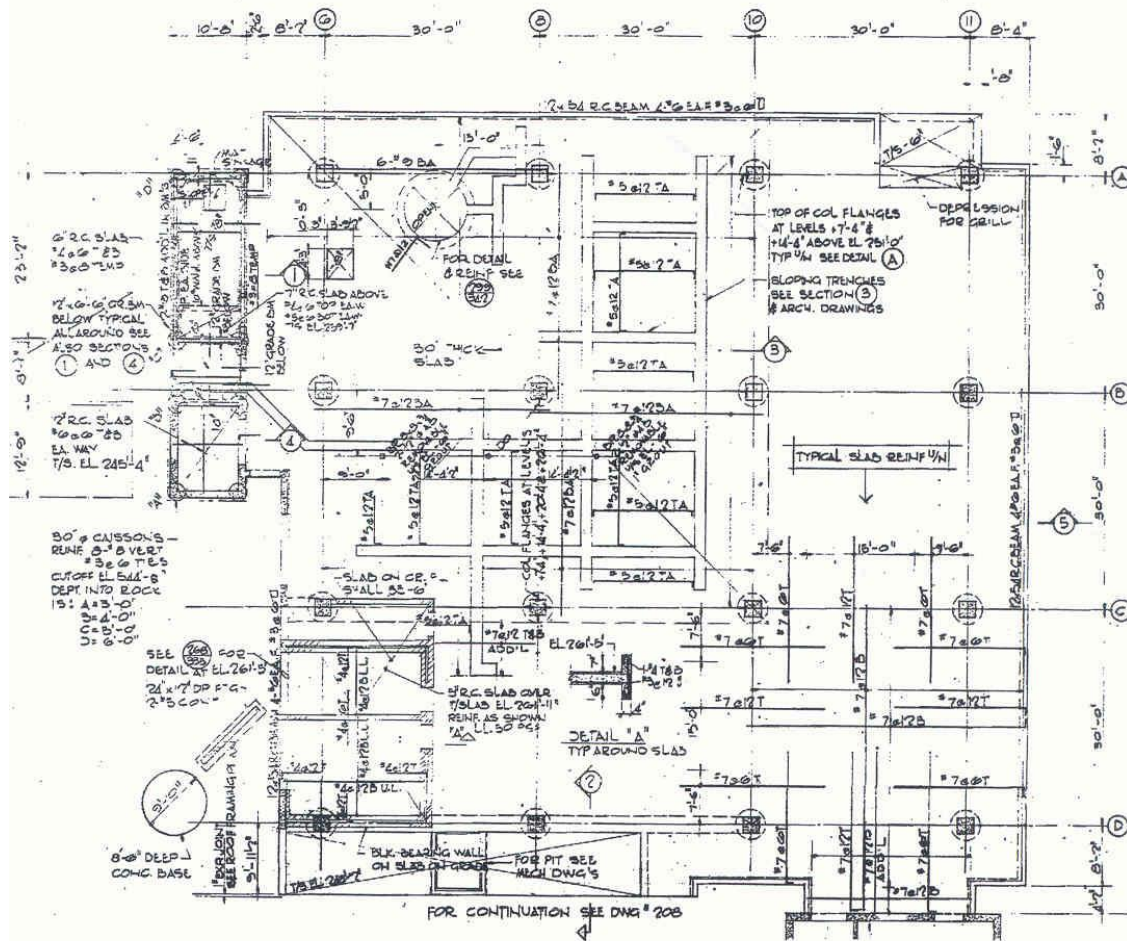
Foundation Plan, Sawyer Building, Module 5.
